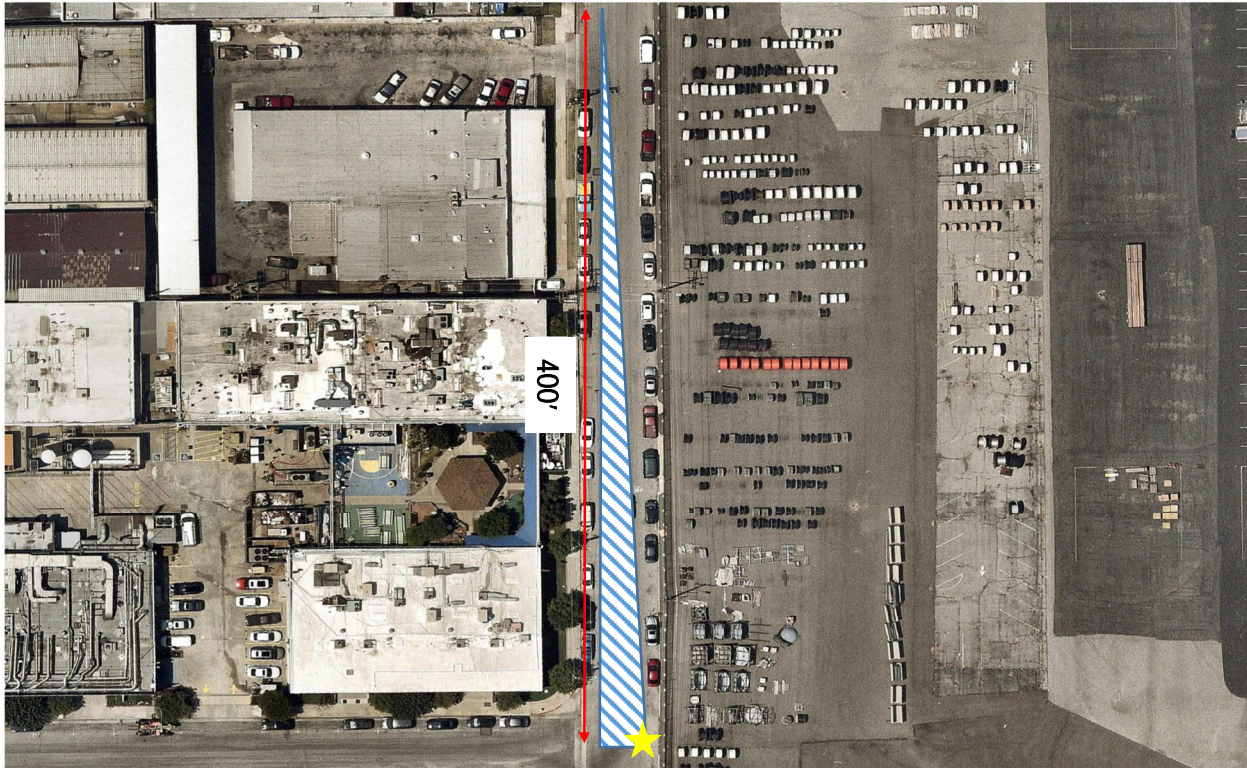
South Raymond Ave—Corner Sight Distance Looking South from Edge of Travel Way = 367 feet
